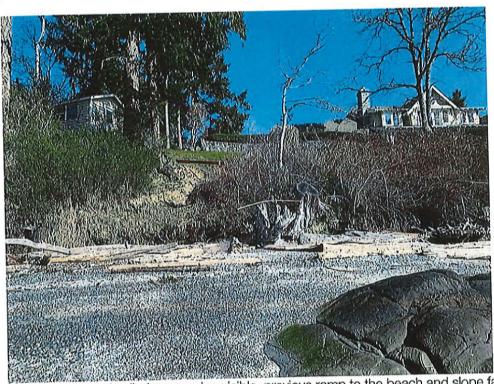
Exposed soils from erosion visible, previous ramp to the beach and slope failure.
